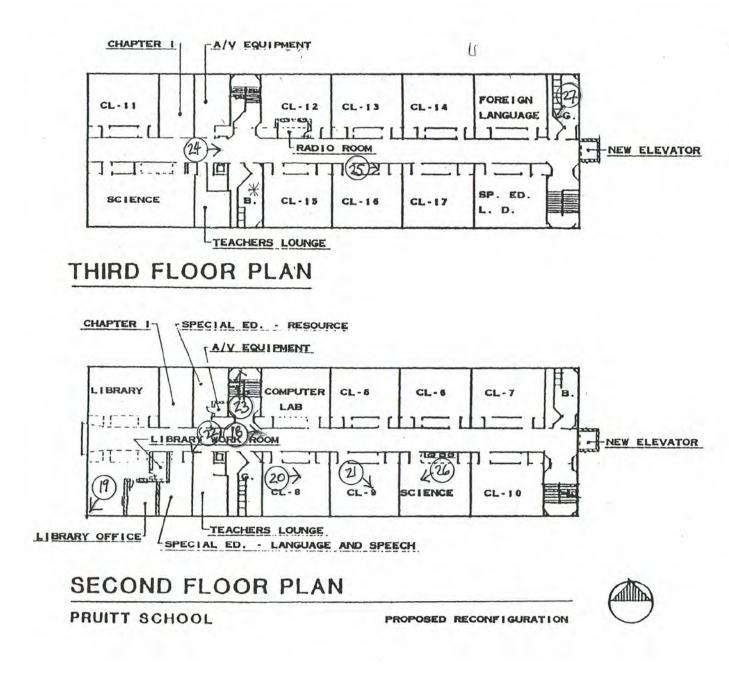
Second and third floor plans and photo map (Plan courtesy of KIPP Inspire Academy).
